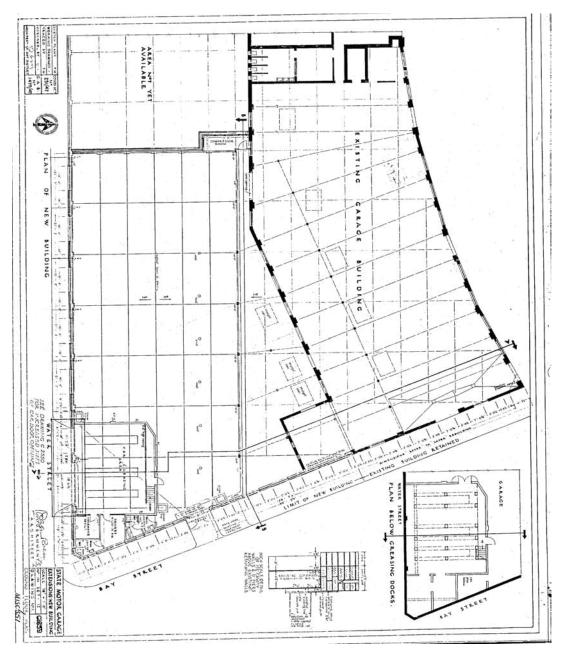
Floor plan of the extension to the Government Motor Garage inclusive of the 1913 building. Designed by the Government Architects Branch of the NSW Public Works Department in 1947. The building was completed in 1953
